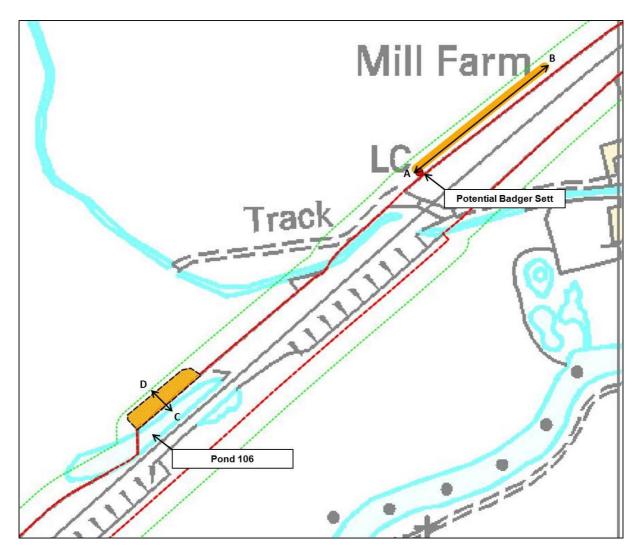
Cross Section Location Plan – (Cross Sections Based on LiDAR (2m resolution).
